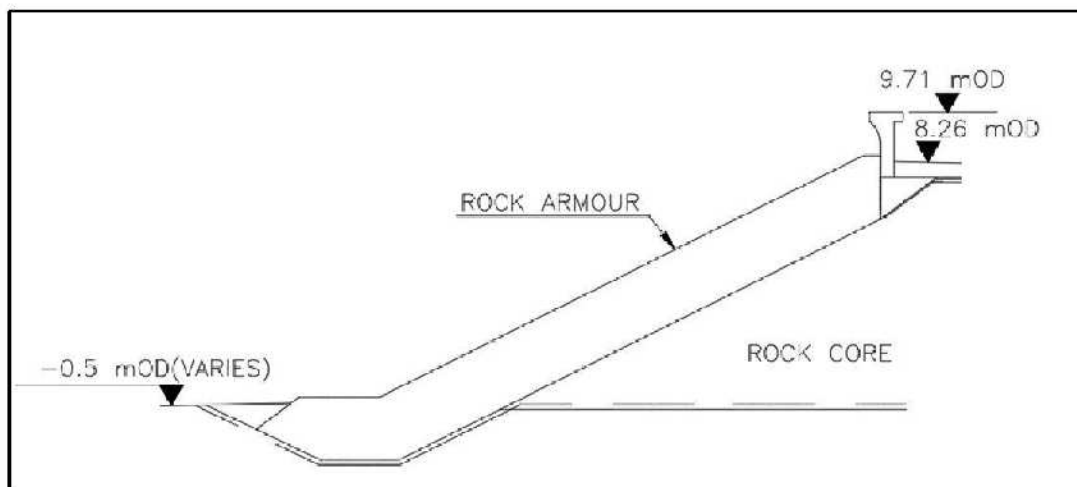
Section-5 (Rock Armour) – Typical Structural Details (not to scale).
